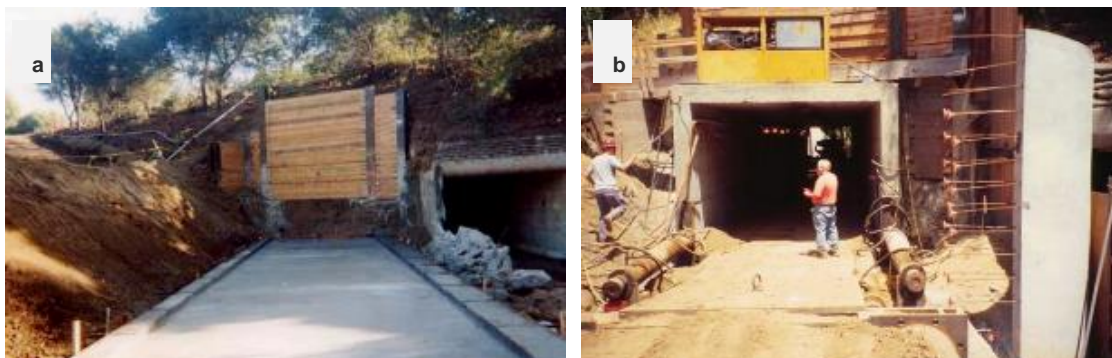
Launch slab along which box is driven in and completed jacked box tunnel
